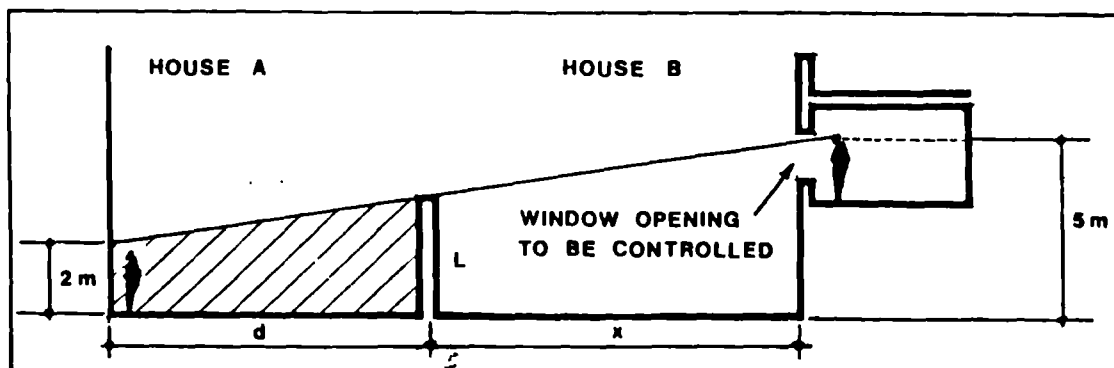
The formula for preventing overlooking by new house windows as proposed by SCET International (1981).
